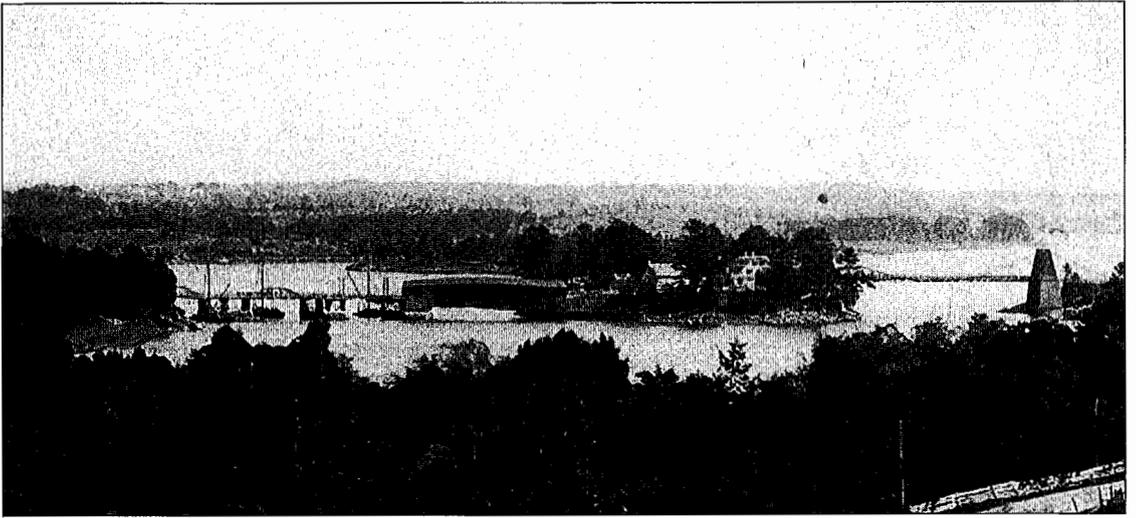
A view of the Newburyport Bridge, post-1812, with Templeman's chain suspension bridge.
